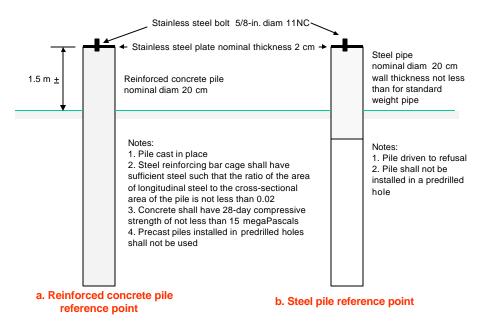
Reference point monumentation. Detail for reinforced concrete pile or steel pile construction
